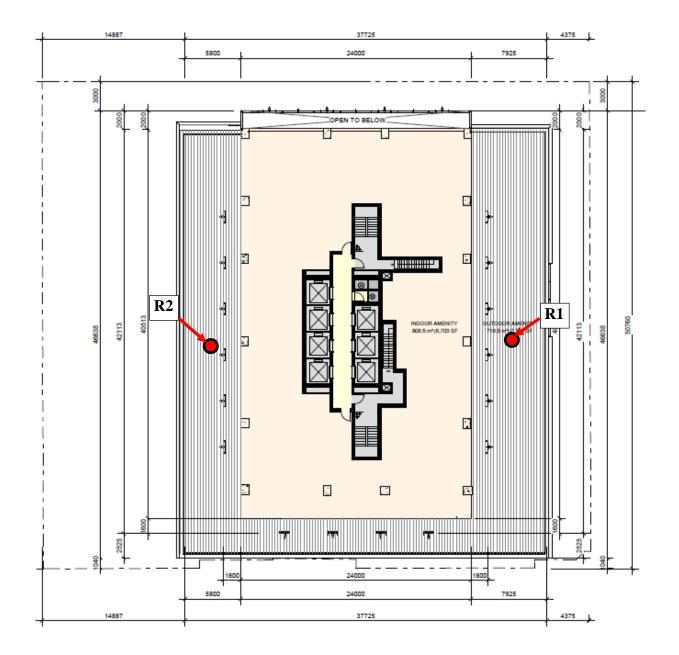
3rd Floor Plan showing Outdoor Sound Level Prediction Locations
